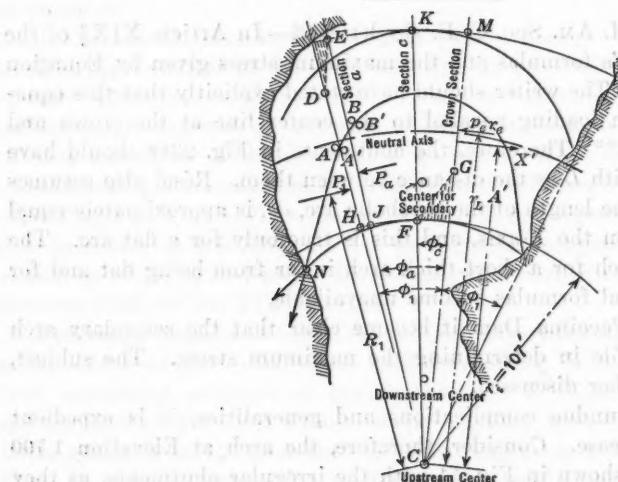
PACOIMA DAM AT ELEVATION 1700.
